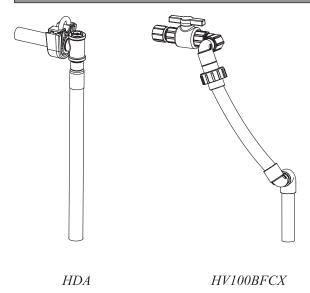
Hanging Style (HDA) and Flexible Hose and Valve Discharge Assemblies
